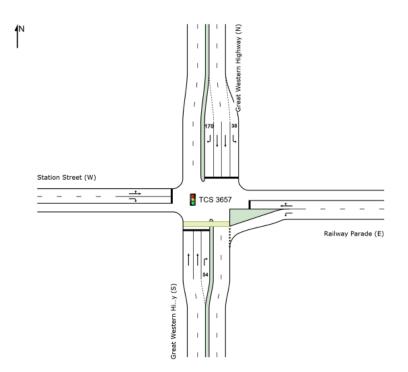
Modelled layout of the GWH and Railway Parade intersection
